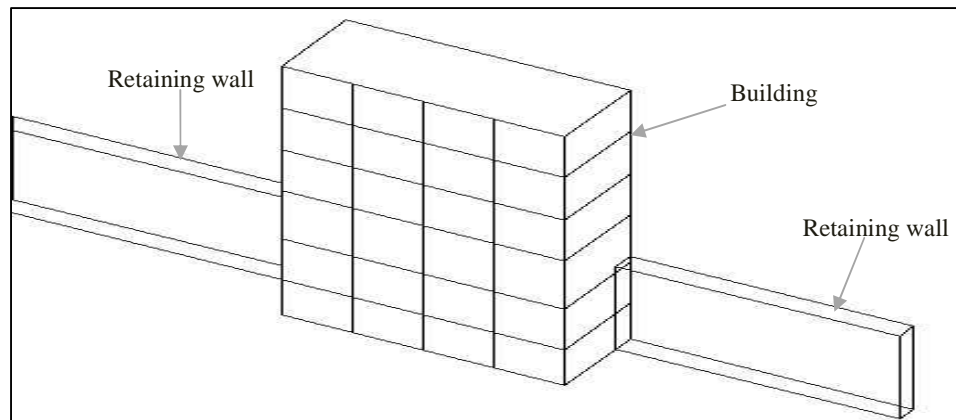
Complete protection of effect of tsunami by high-rise building & retaining wall
